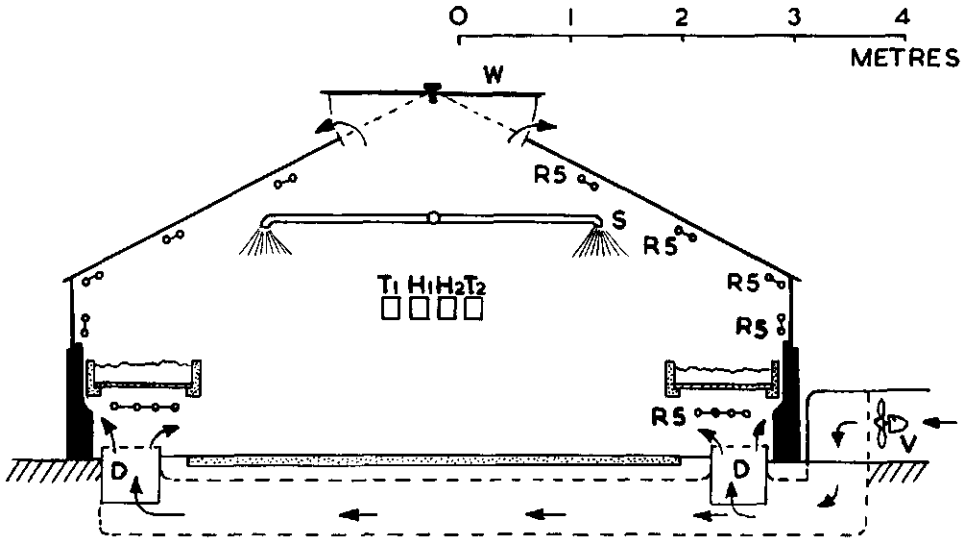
CROSS SECTION OF A GLASSHOUSE
